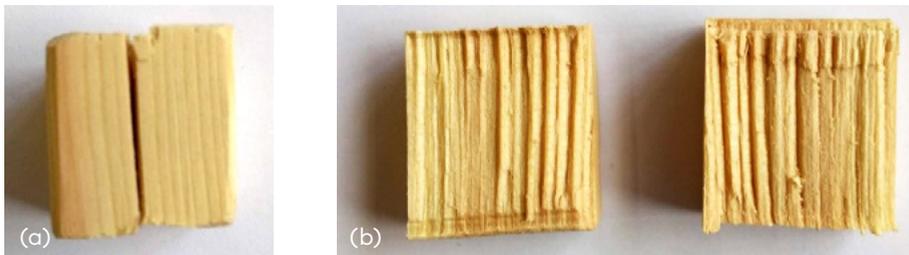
Image of clear-wood specimen subject to shear: (a) side elevation, (b) view of failure plane.
